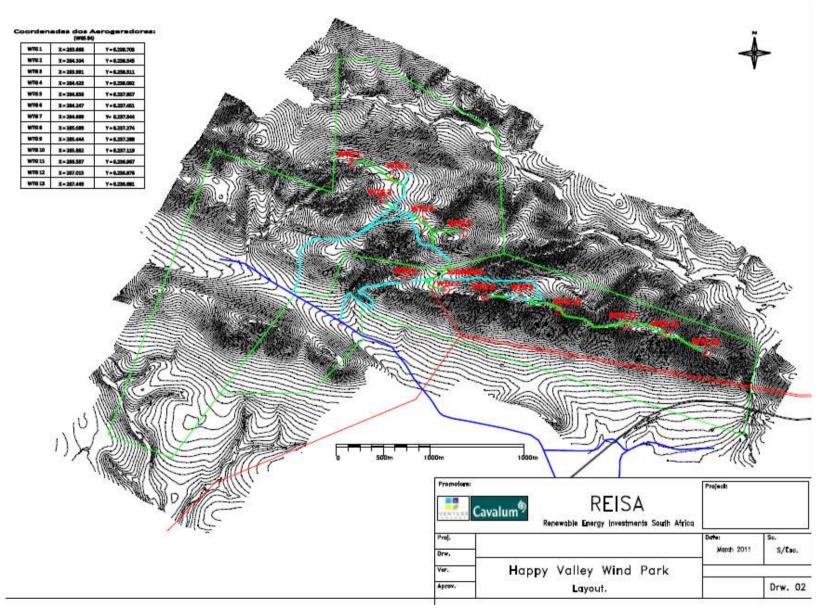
Preliminary access road layout for the proposed Happy Valley Wind Energy Facility.
